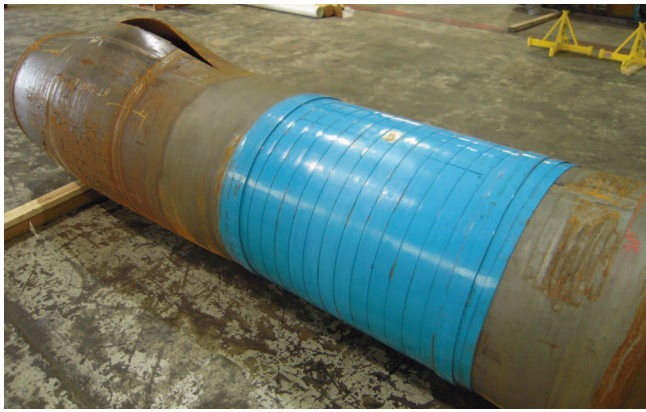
Burst test specimen. The XHab™ repair was wrapped over a machined 80% wall-loss defect. The failure occurred in the adjacent 'good' pipe.
